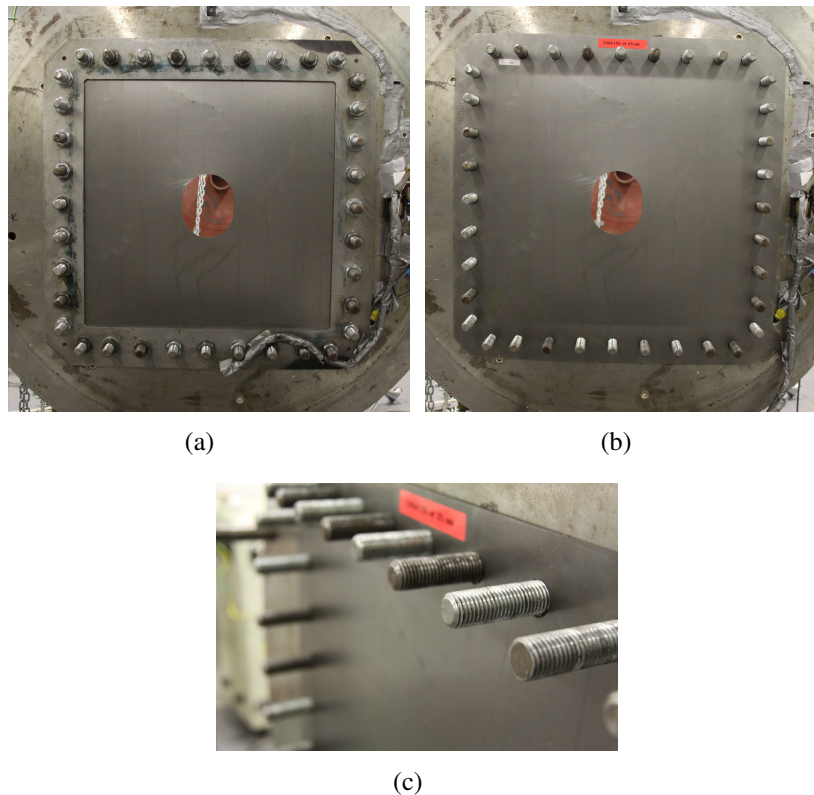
Restrained plate (a) with clamping frame, (b) clamping frame removed and (c) close up inspection around bolts.
